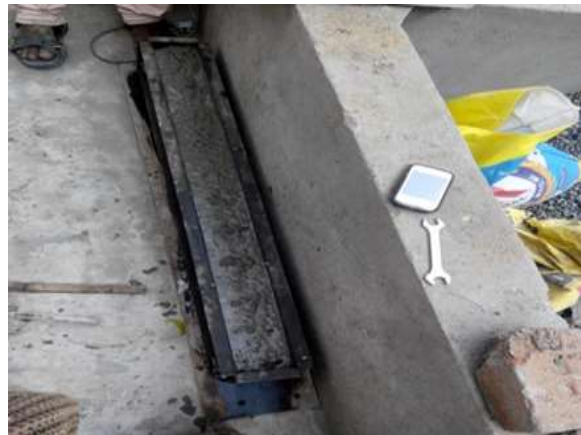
DETAILS OF SPECIMEN FOR M30 GRADE OF CONCRETE (per m³)
